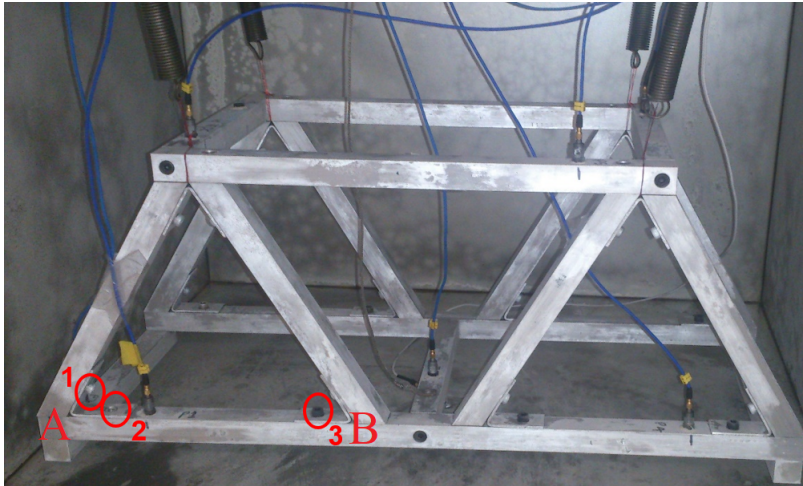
Bridge truss model inside chamber and damage locations.
